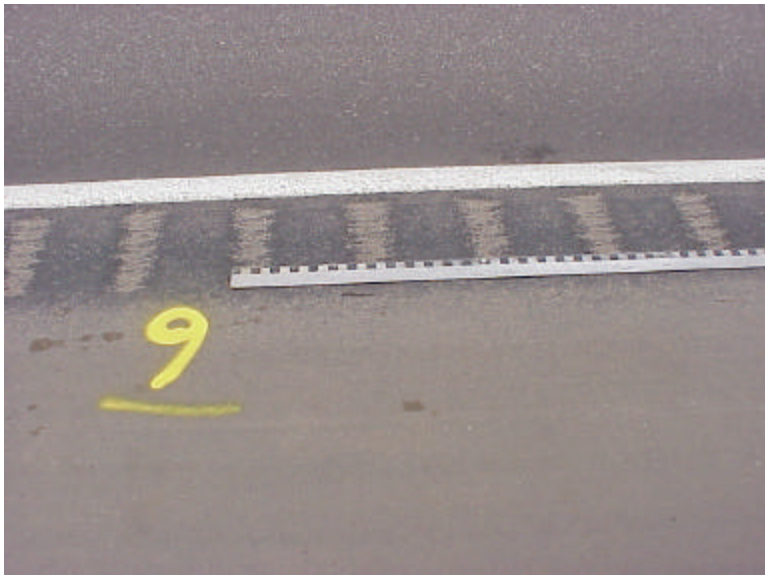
Section 9 has 4-1/2 to 5-inch grooves with 6-1/2 to 7-inch flats. The plans called for a depth of 1/8 inch but they average .28 inches – slightly over 1/4- inch.
